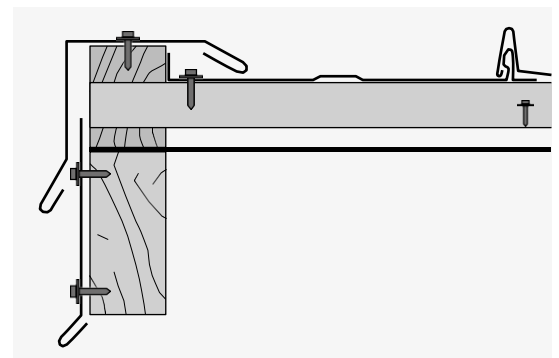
CROSS-SECTION OF THE ROOF SKINNED WITH THE ROOF PANELS
